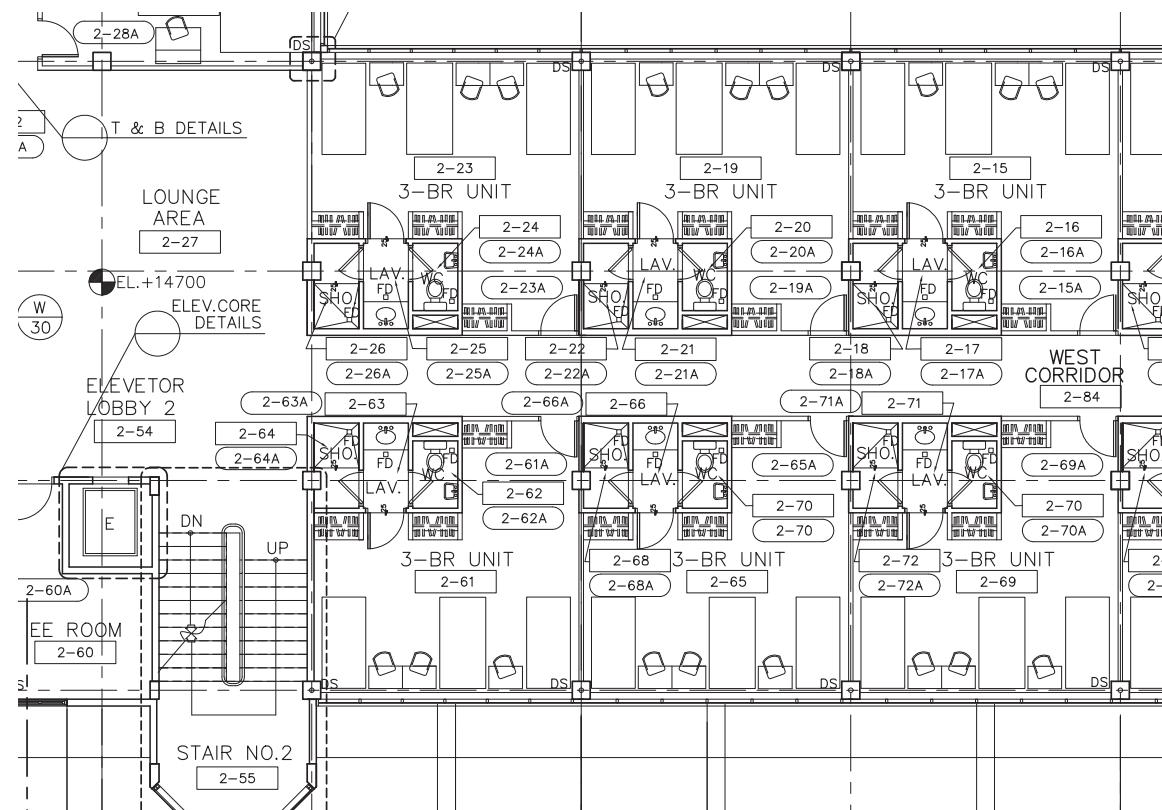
Partial floor plan of a building showing room identification tags, which are referenced to a Room Finish Schedule document
